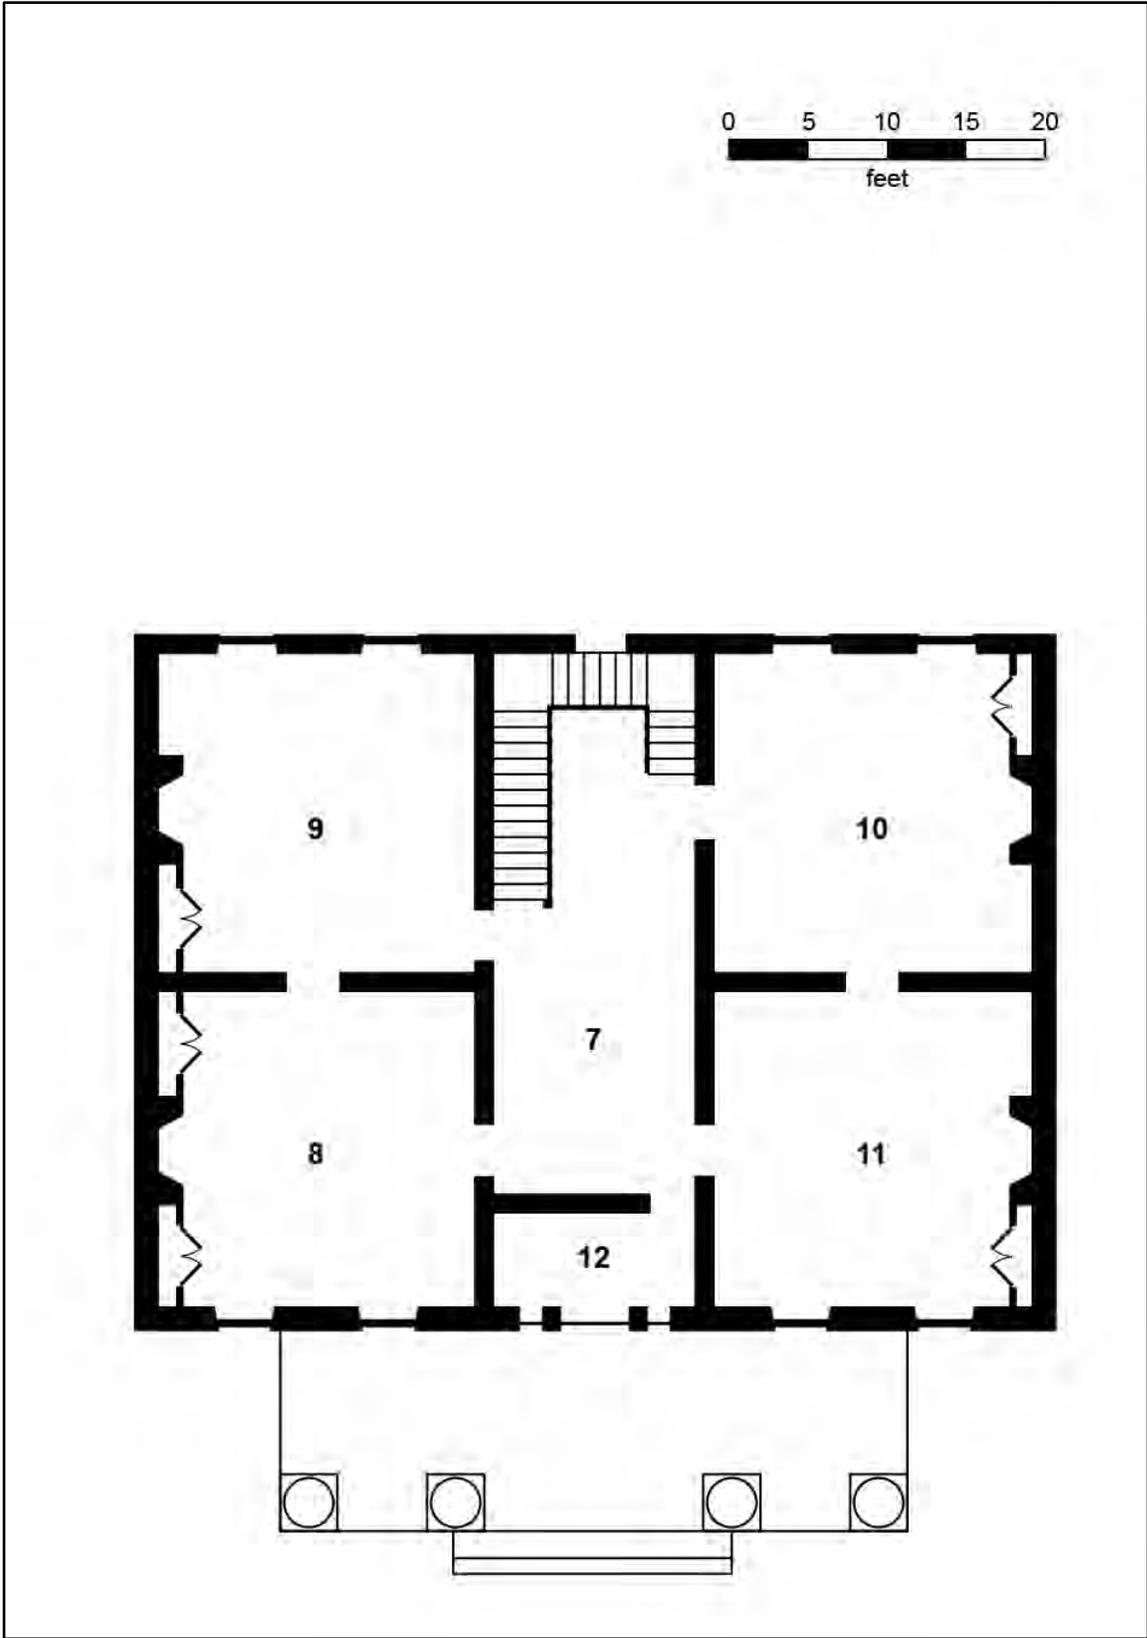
Second story floor plan of Helm Place. Adapted from the original first story floor plan by Patrick Snadon.
